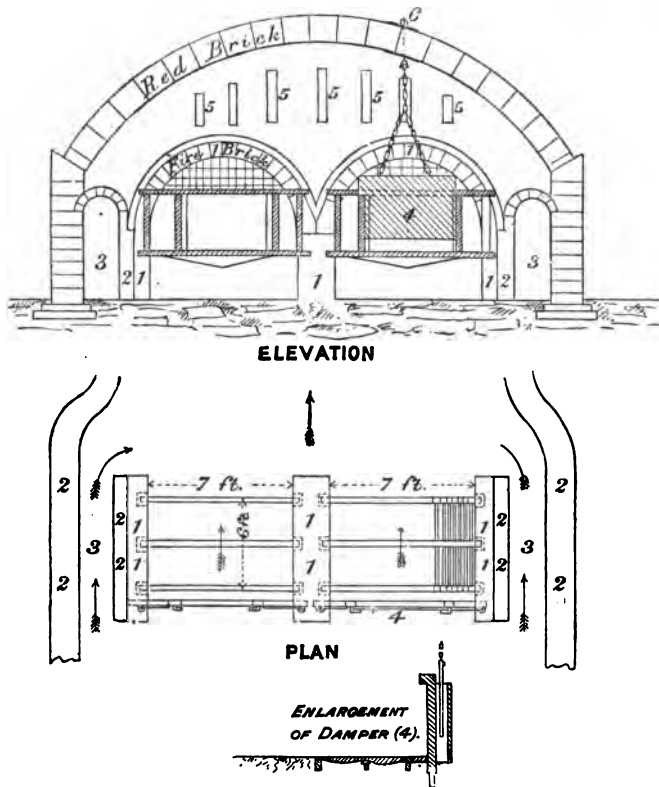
Double ventilating furnace. 1, fire-brick linings; 2, common red brick; 3, man-hole and air-passages; 4, damper doors; 5, air-holes; 6, arrangement for adjusting damper door.
